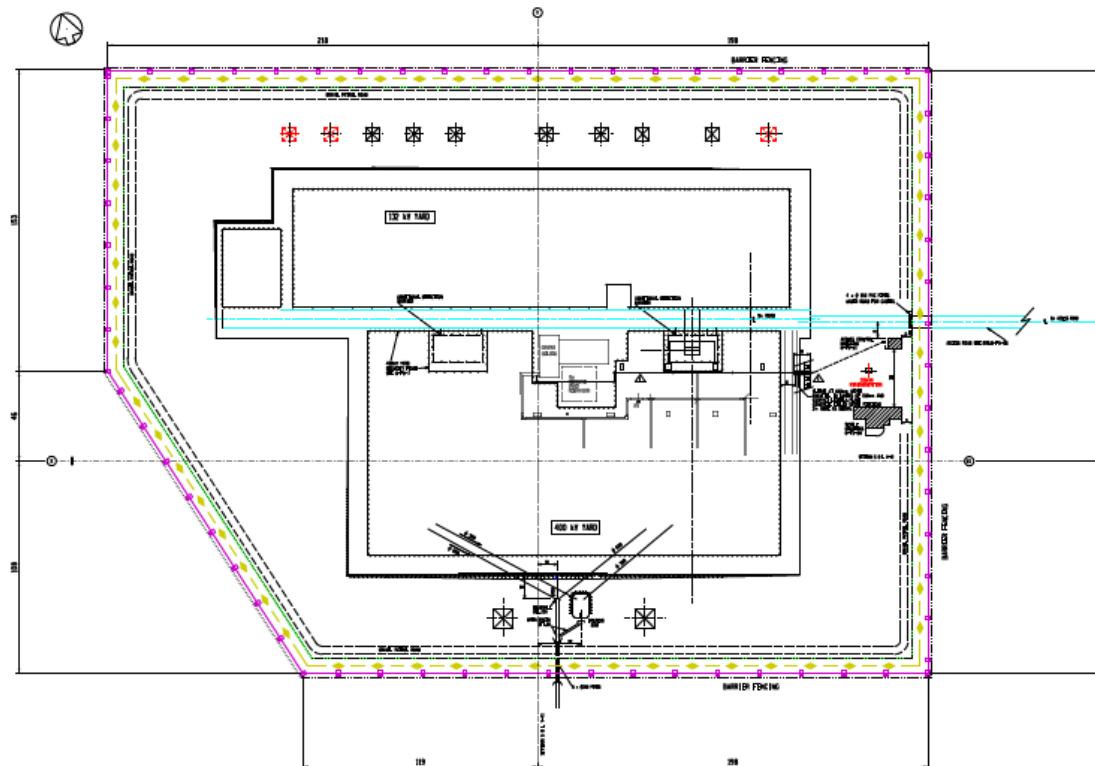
Typical site layout Tx Substation (refer to drawing THE22P02-SE-42)
